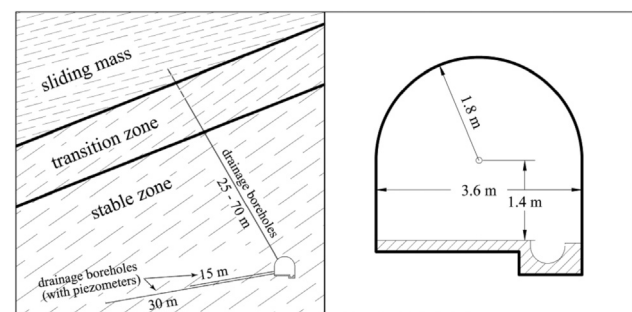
Typical cross section of drainage tunnel (Eberhardt *et al.*, 2007).
